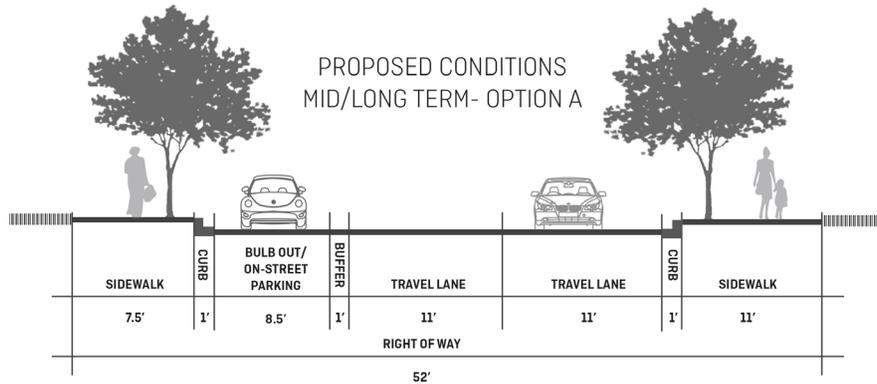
Willard Street at Florida Avenue (West Bound)
